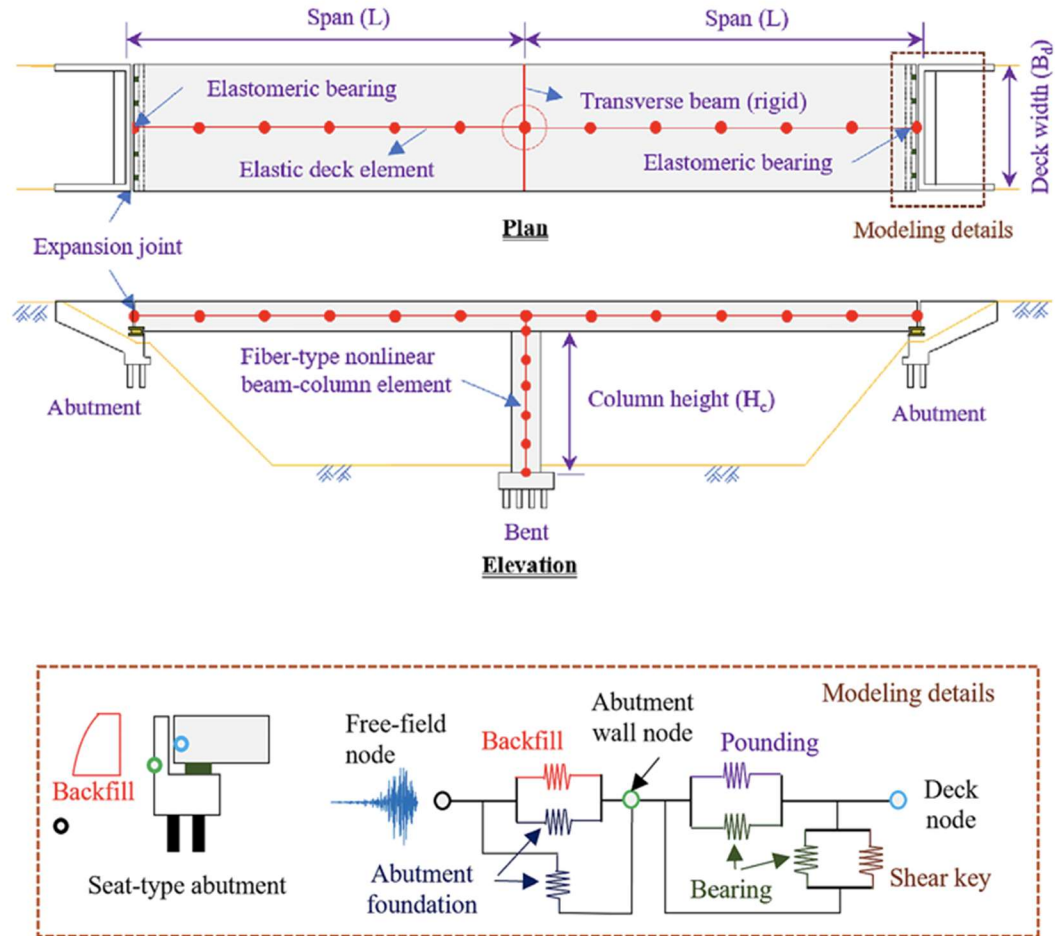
General Configuration of Canadian Reinforced Concrete Highway Bridge (Xao and Xie 2024)
